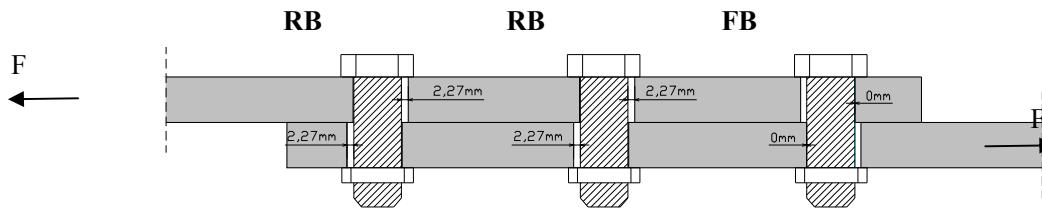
Connection Layout Considering the Presence of Geometrical Imperfections
